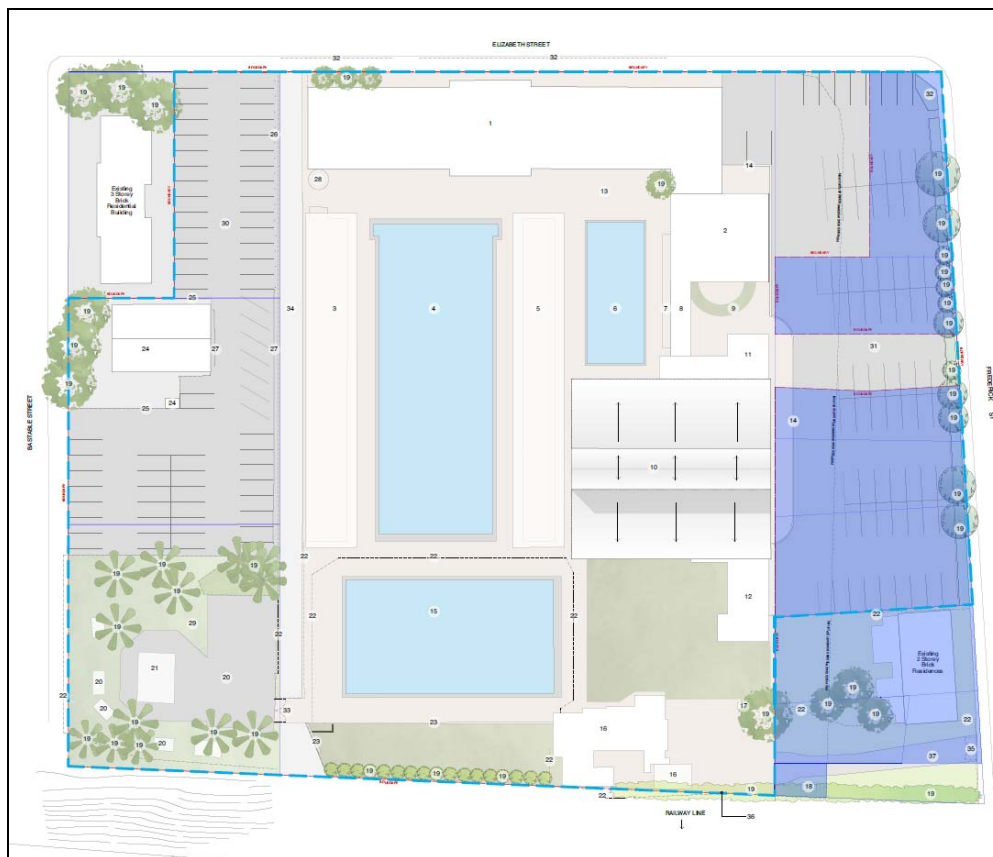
Existing site and location plan highlighting areas (blue) owned by RMS and Ausgrid
